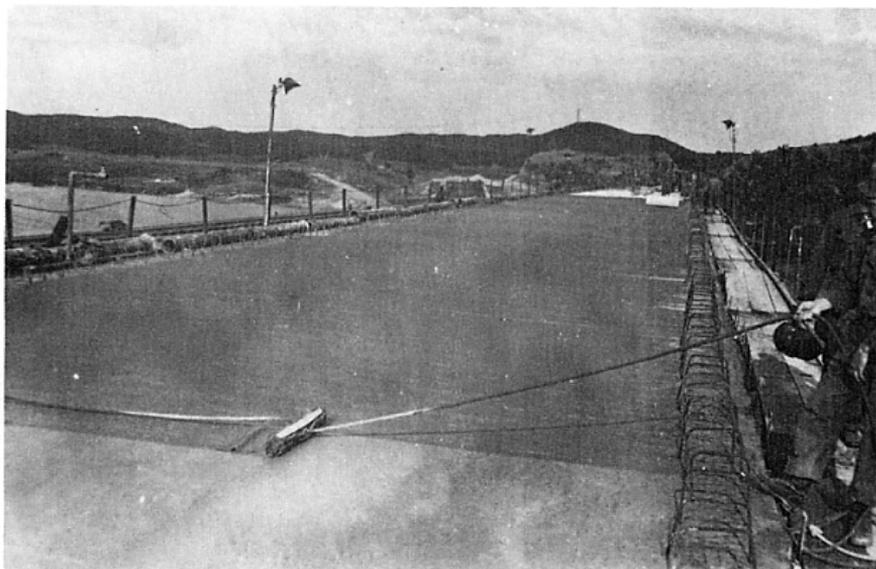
A burlap drag being used to give the deck surface the desired rough texture perpendicular to traffic. Reinforcing steel for curbing is visible.
